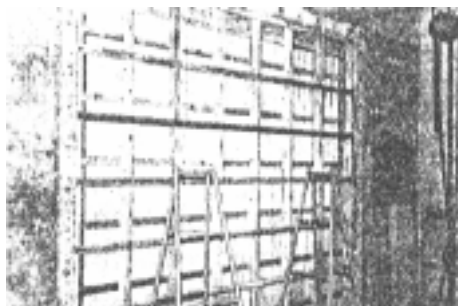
Construction of test wall at the 3.0m x 3.0m opening.
